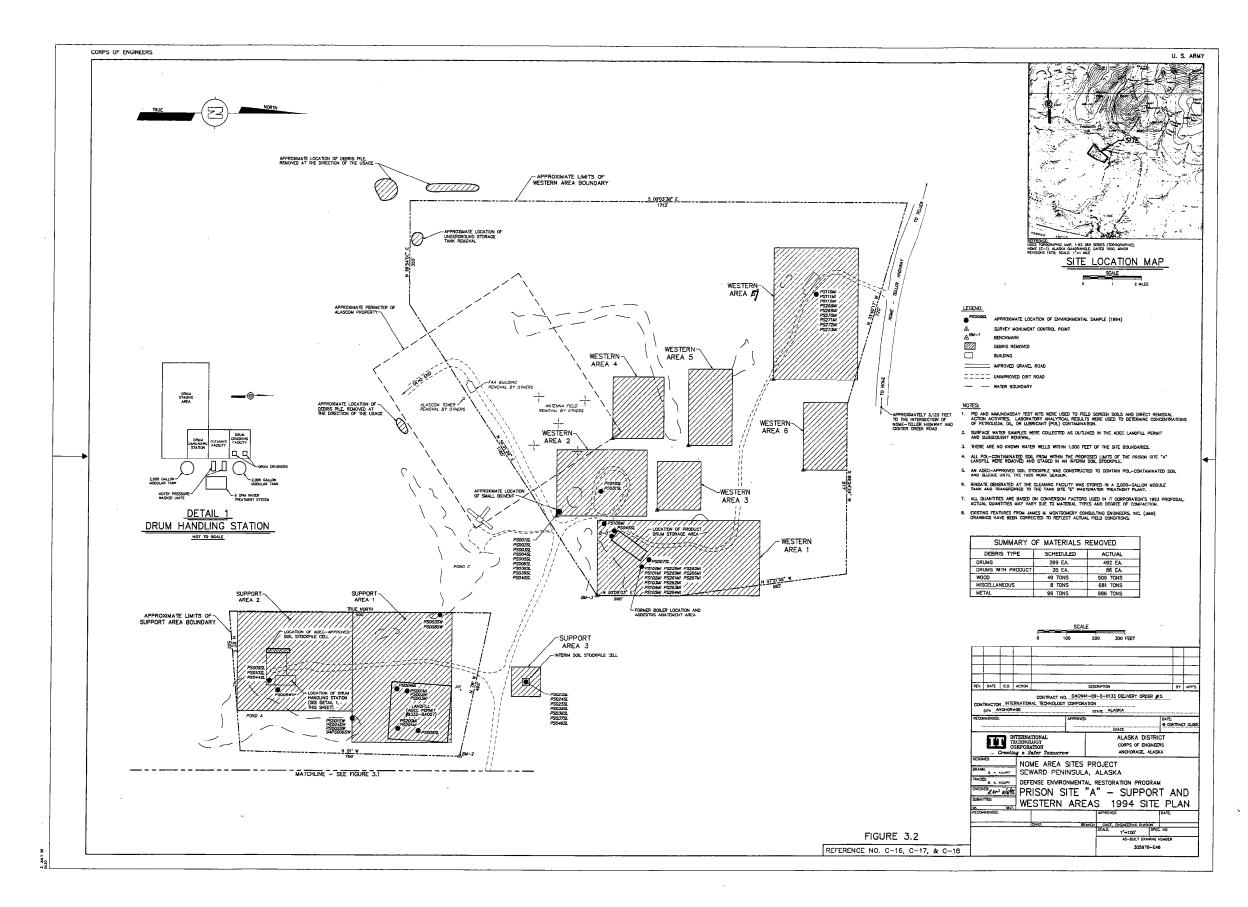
Prison Site 'A' Support and Western Areas 1994 Site Plan
